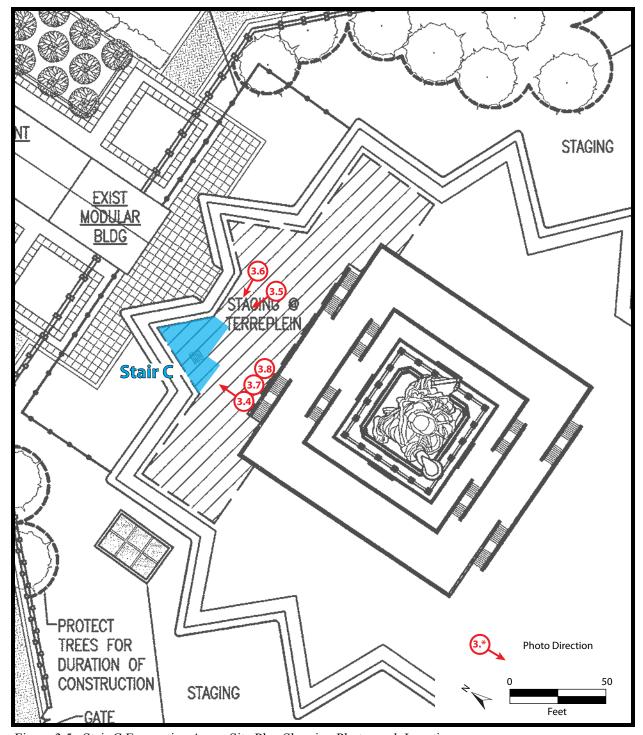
Stair C Excavation Area: Site Plan Showing Photograph Locations.
